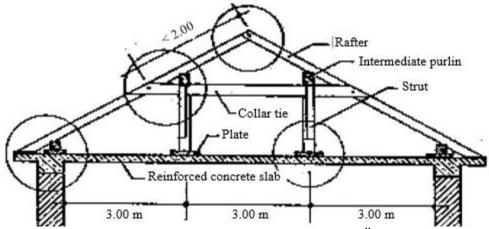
Free standing roof truss with two hangers (Özdemir, n.d.)
